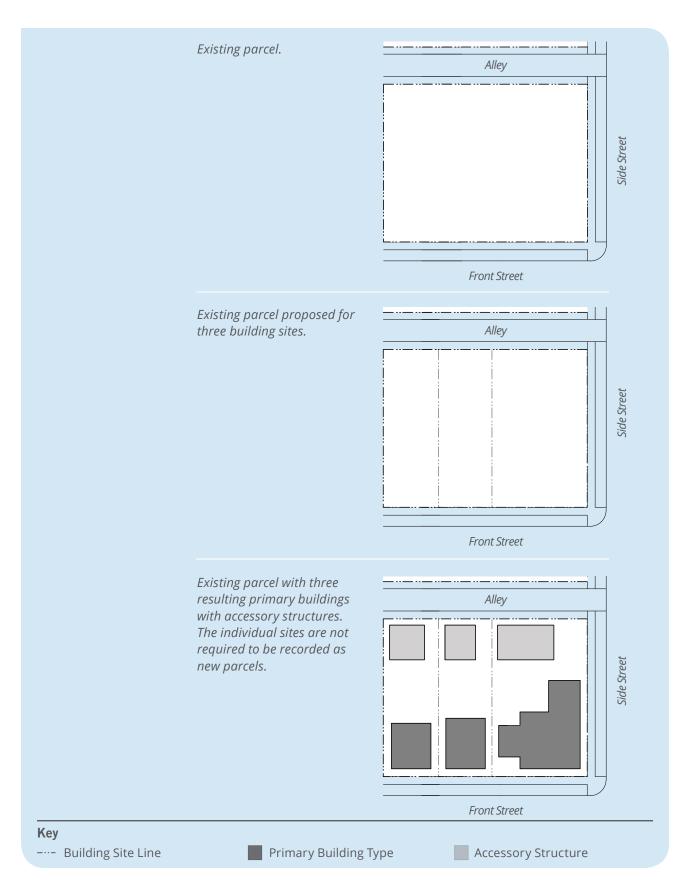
A: Example of Multiple Building Sites on an Existing Parcel.
